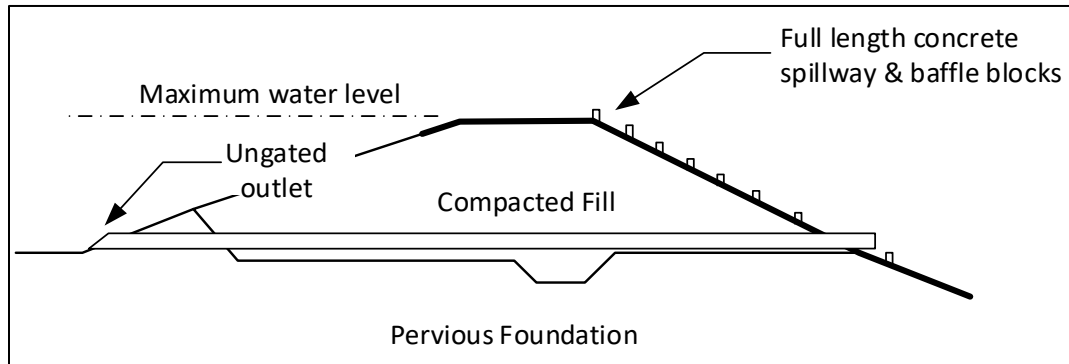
Schematic cross section of the John B. Robert Dam, the tallest stormwater dam in Albuquerque, New Mexico (adapted from AMAFCA files).
